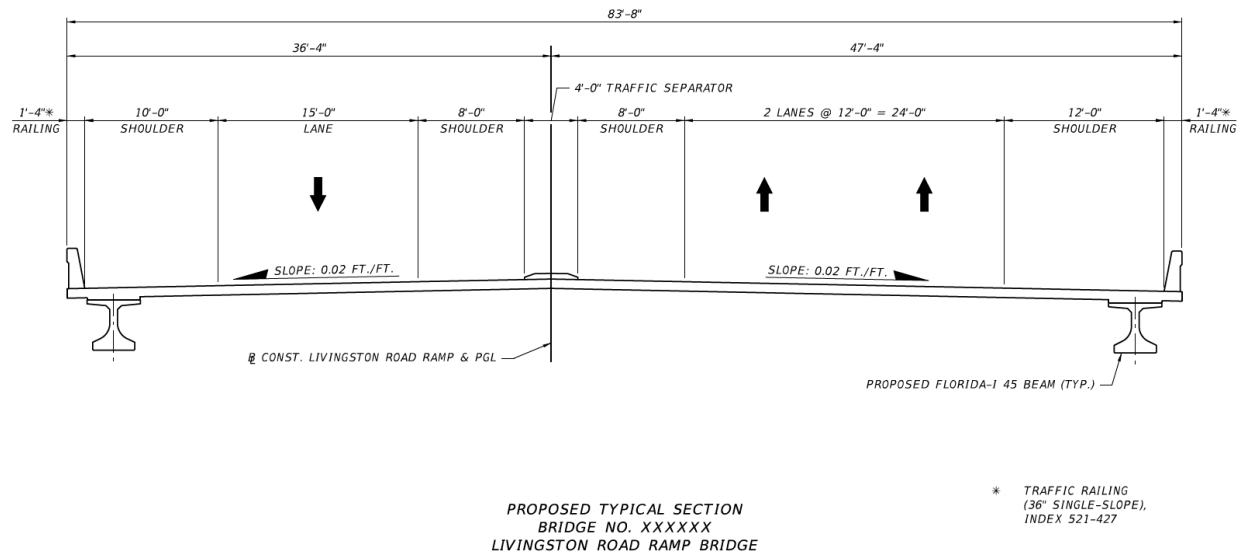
shows the proposed typical section of the new Livingston Rd. bridge over SR 429. The proposed bridge typical section for this bridge is two (2) 12'-0" eastbound travel lanes, a 12'-0" outside shoulder, 8'-0" inside shoulder, one (1) 15'-0" westbound travel lane, a 10'-0" outside shoulder, and 8'-0" inside shoulder. The wider inside and outside shoulder widths are provided to meet design vehicle turning path requirements. The vertical clearance will meet the minimum vertical clearance of 16'-6" per FDM Table 260.6.1. A bridge number will be requested during the Design Phase.
